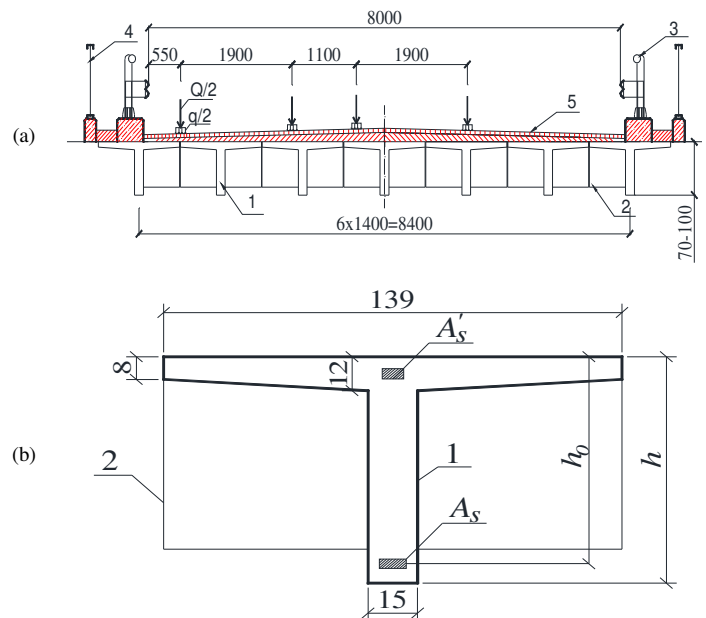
Cross-sections: (a) of the superstructure according to "Issue 56", (b) of a typical beam. 1 – T-section beam with conventional reinforcement, 2 – diaphragms, 3 – RC curbs with metal railings, 4 – metal barrier fences, 5 – multi-layer road surface.
